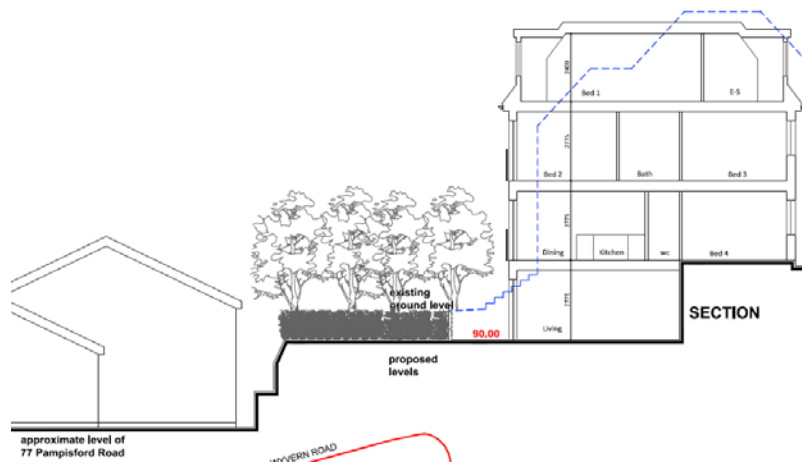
Section showing relationship between 77 Pampisford Road and the application site
